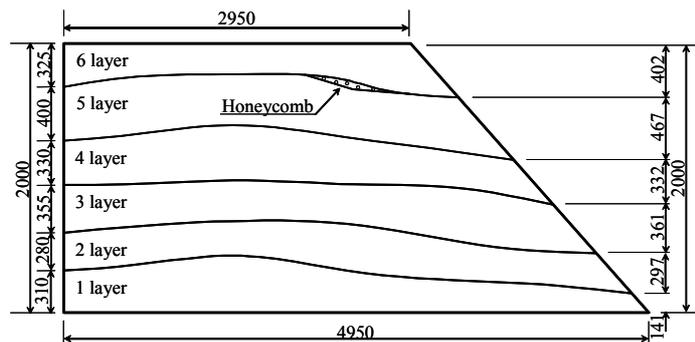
Concrete surface after formwork removal (gable on ready-mixed concrete chute side)
